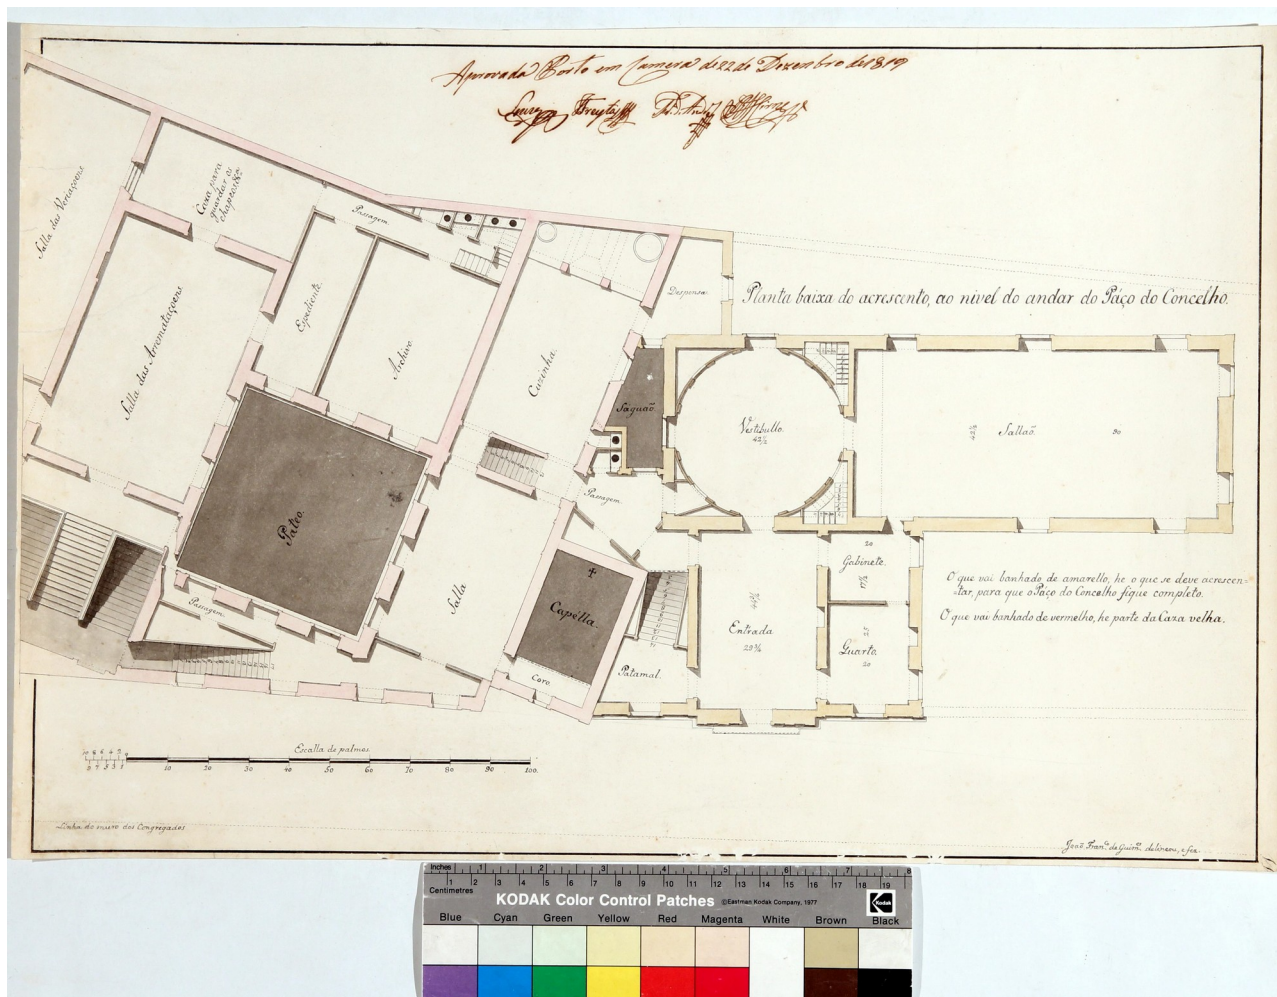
Plan for the first floor of the building in Rua dos Reis Magos
